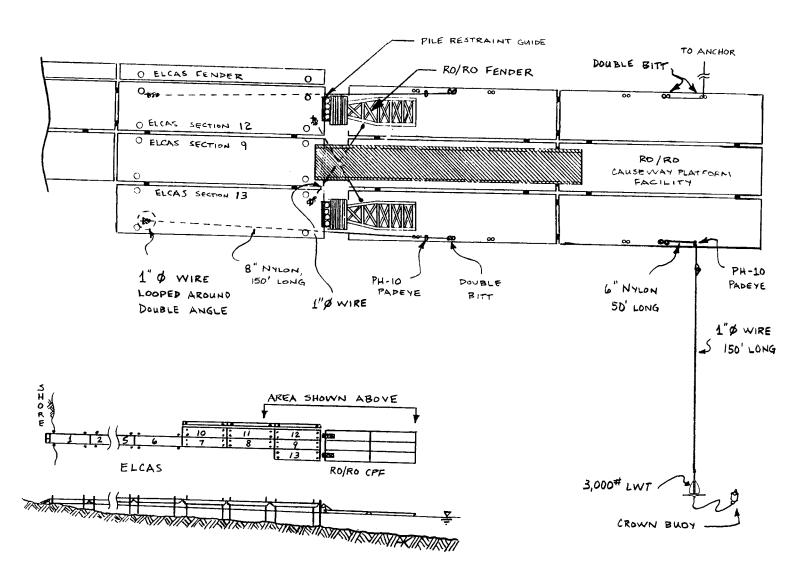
Mooring Arrangement - CPF to ELCAS, as Installed
